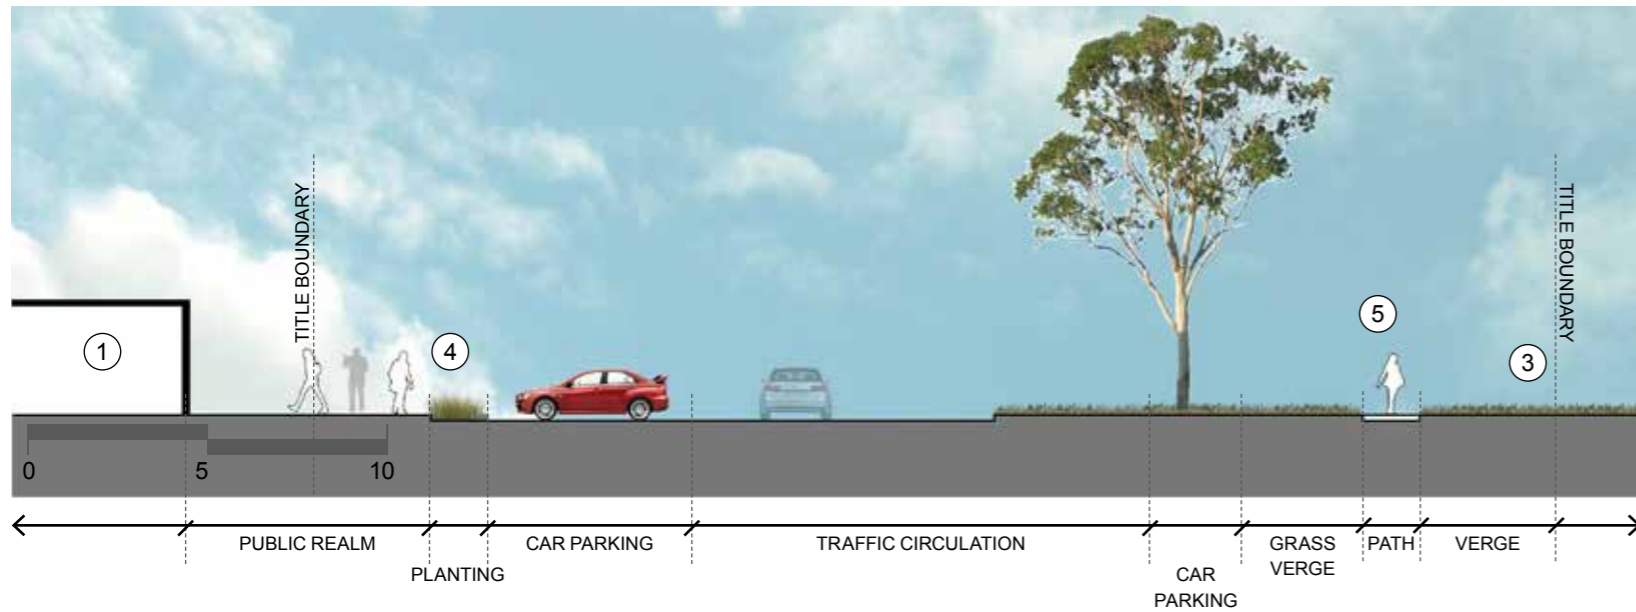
Kinglake proposed streetscape section (AA)
